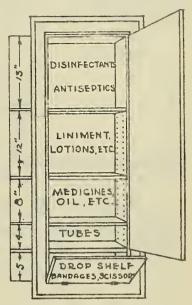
PLATE I -BATHROOM STORAGE FACILITIES WALL CABINETS
